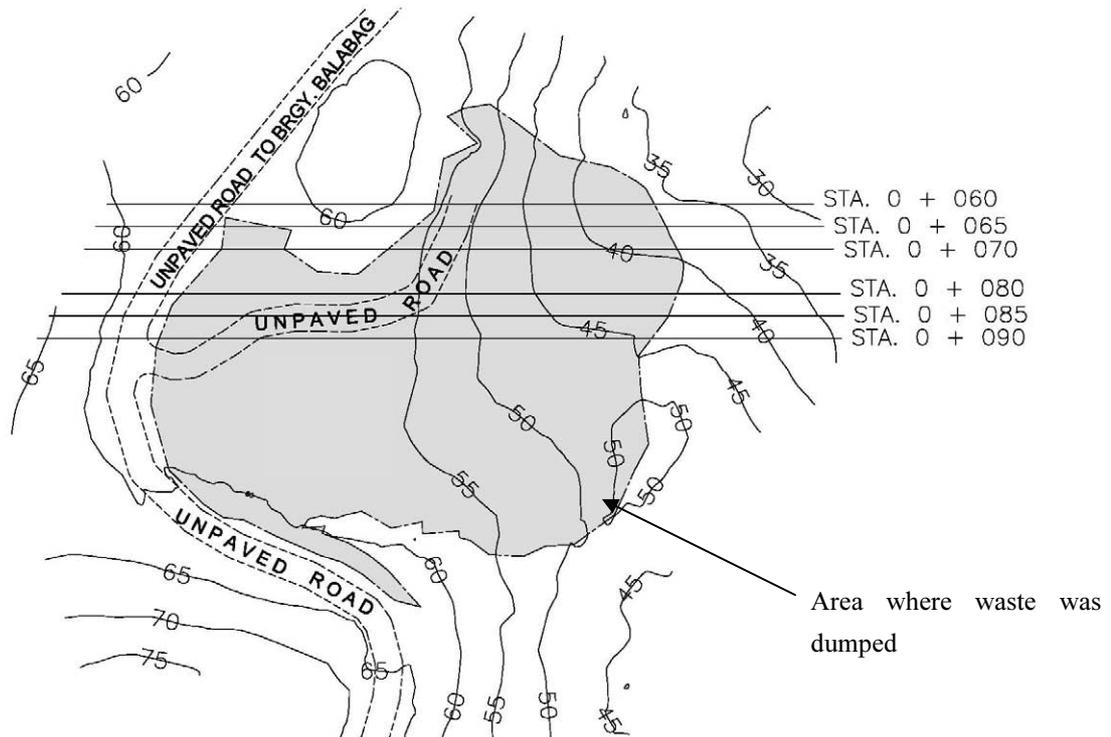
Topography and Area of where Waste was Dumped at the Old Dump Site
